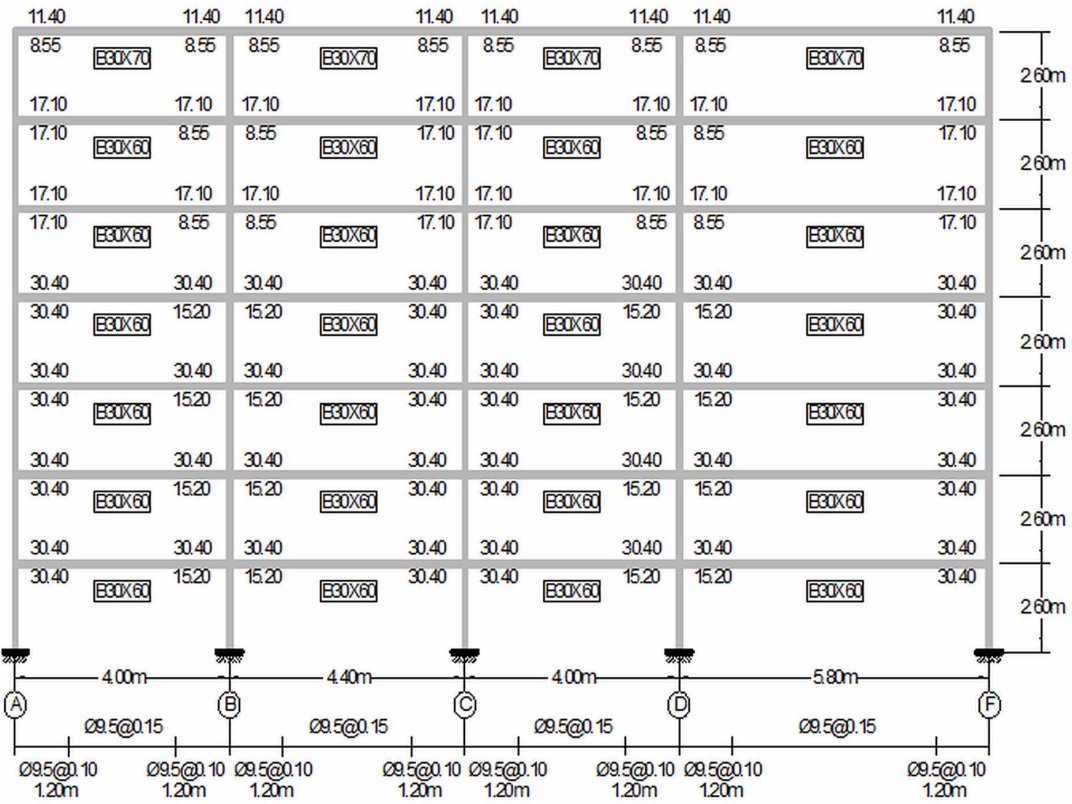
Residential building, geometry and reinforcement in columns of the frame 8
